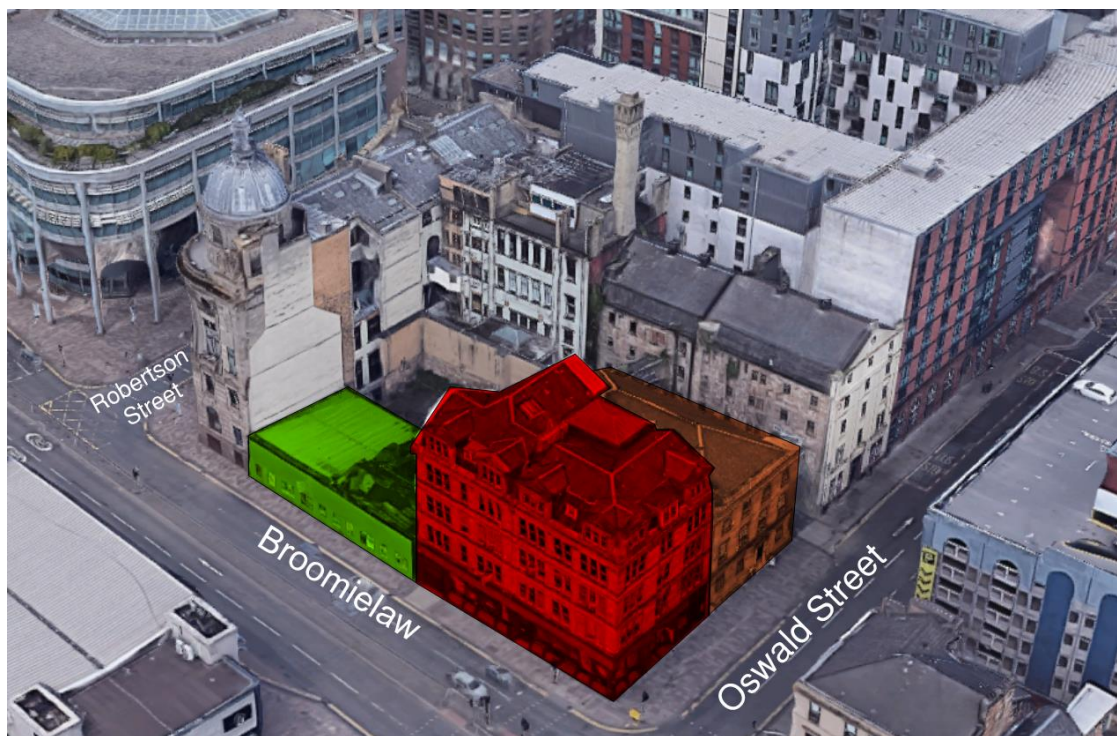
Aerial view of proposed site – (green) Old Public House (red) Oswald Chambers (orange) 9 Oswald Street
